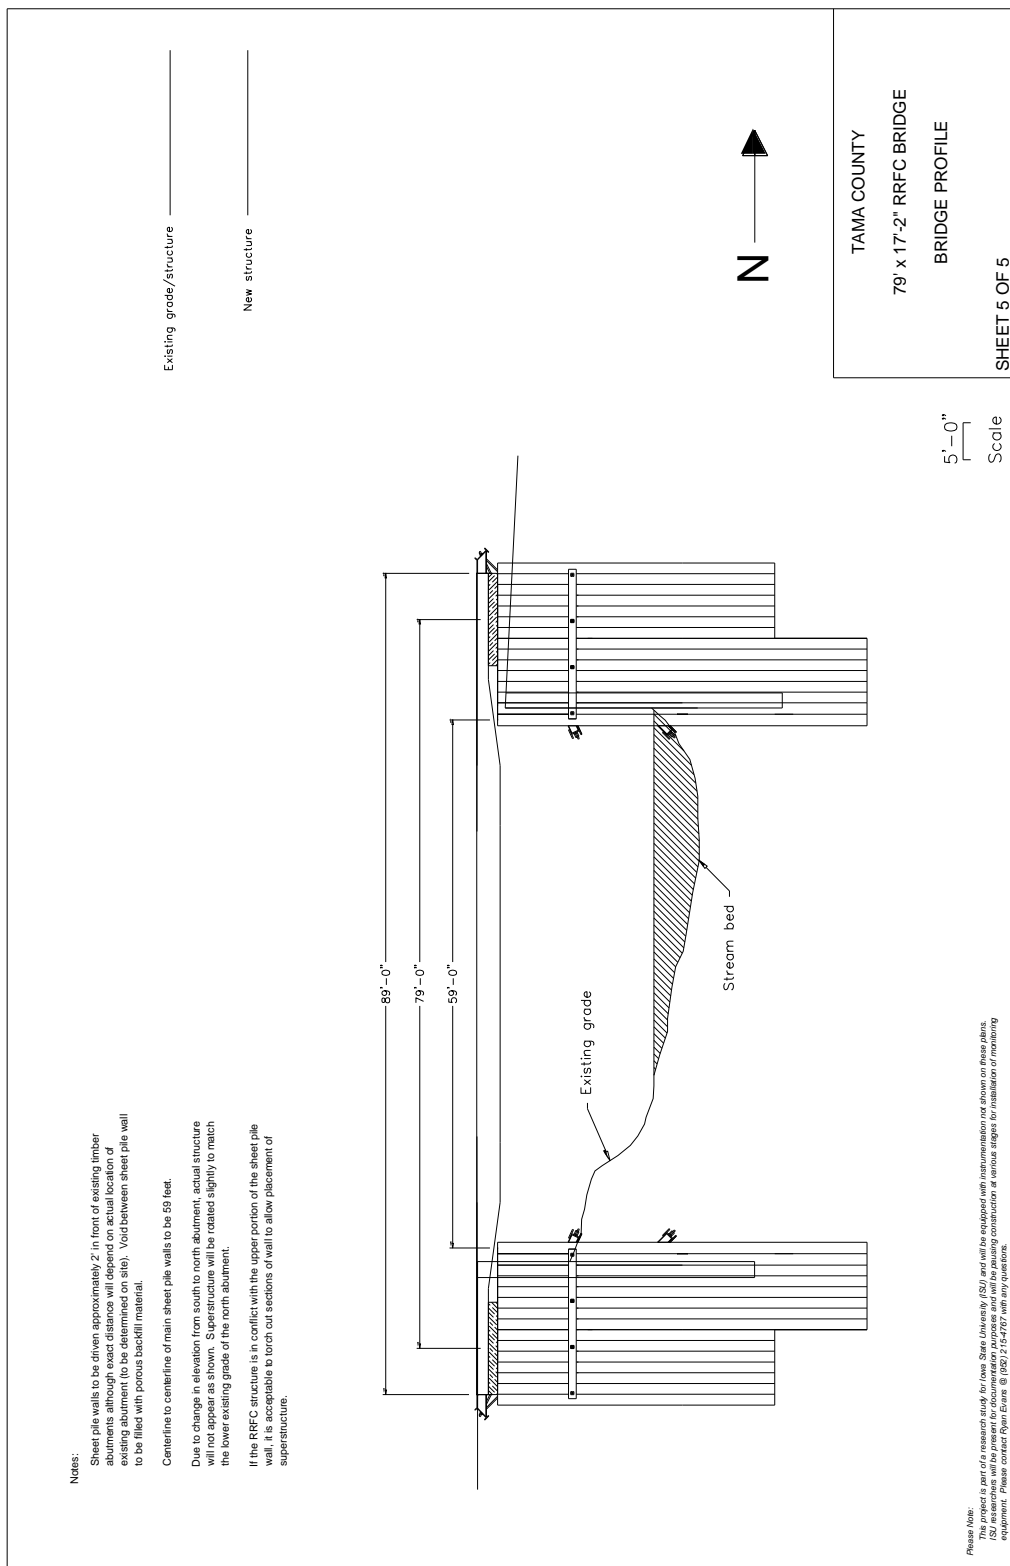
Profile of bridge for demonstration project in TC, Iowa
